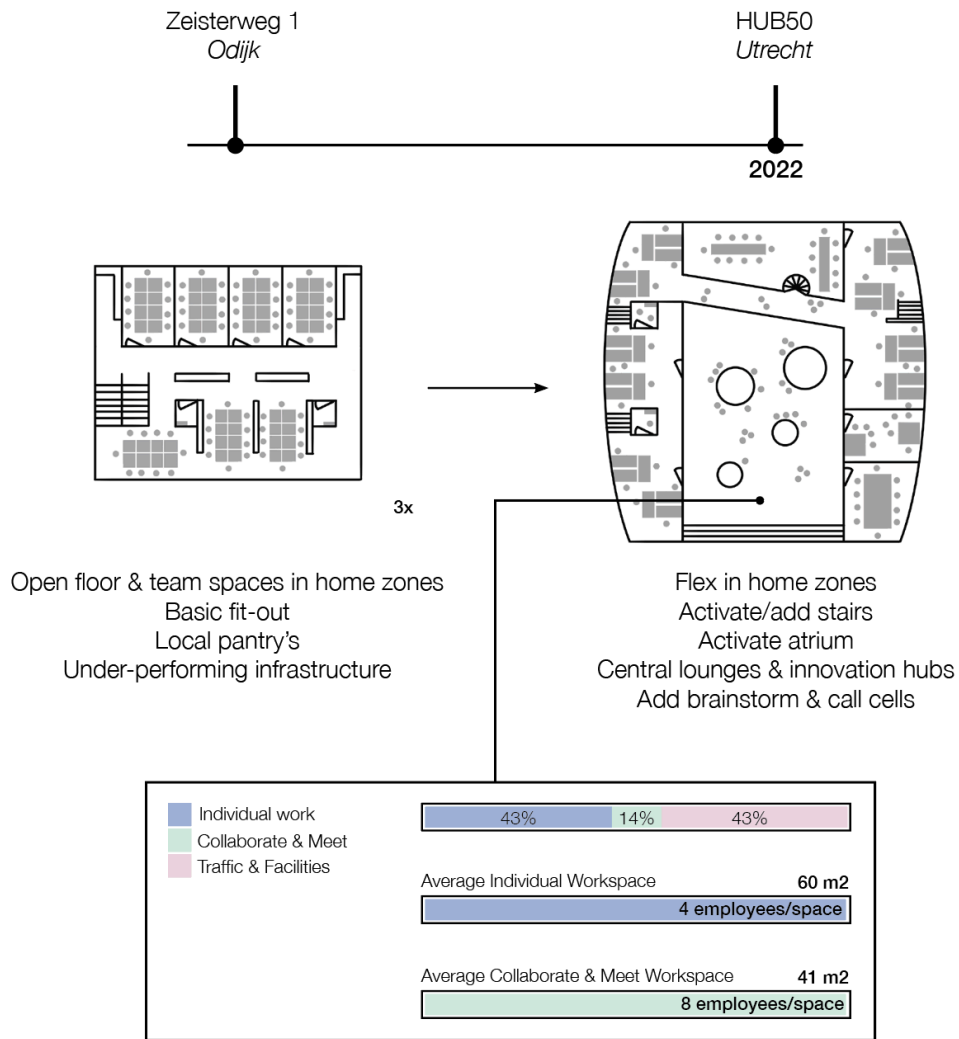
Schematic layout and floor plan analysis of HUB50 (own illustration based on floor plan analysis)
